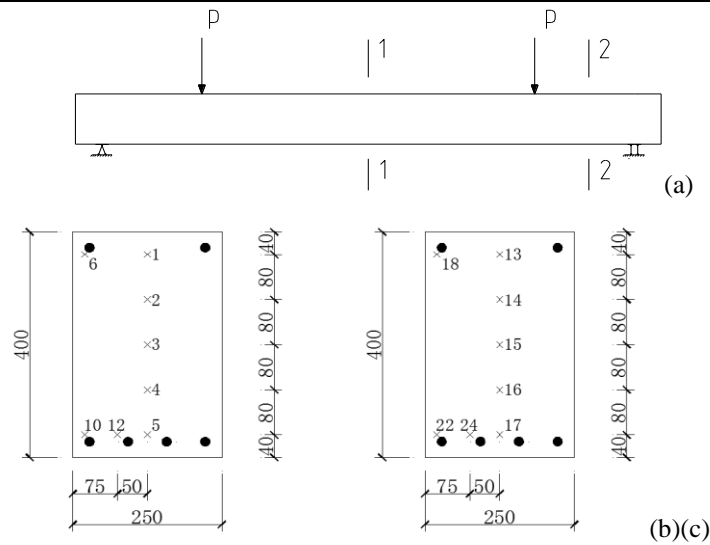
Location of thermocouples (dimensions in mm): a) Thermocouple; b) 1-1 section; c) 2-2 section
